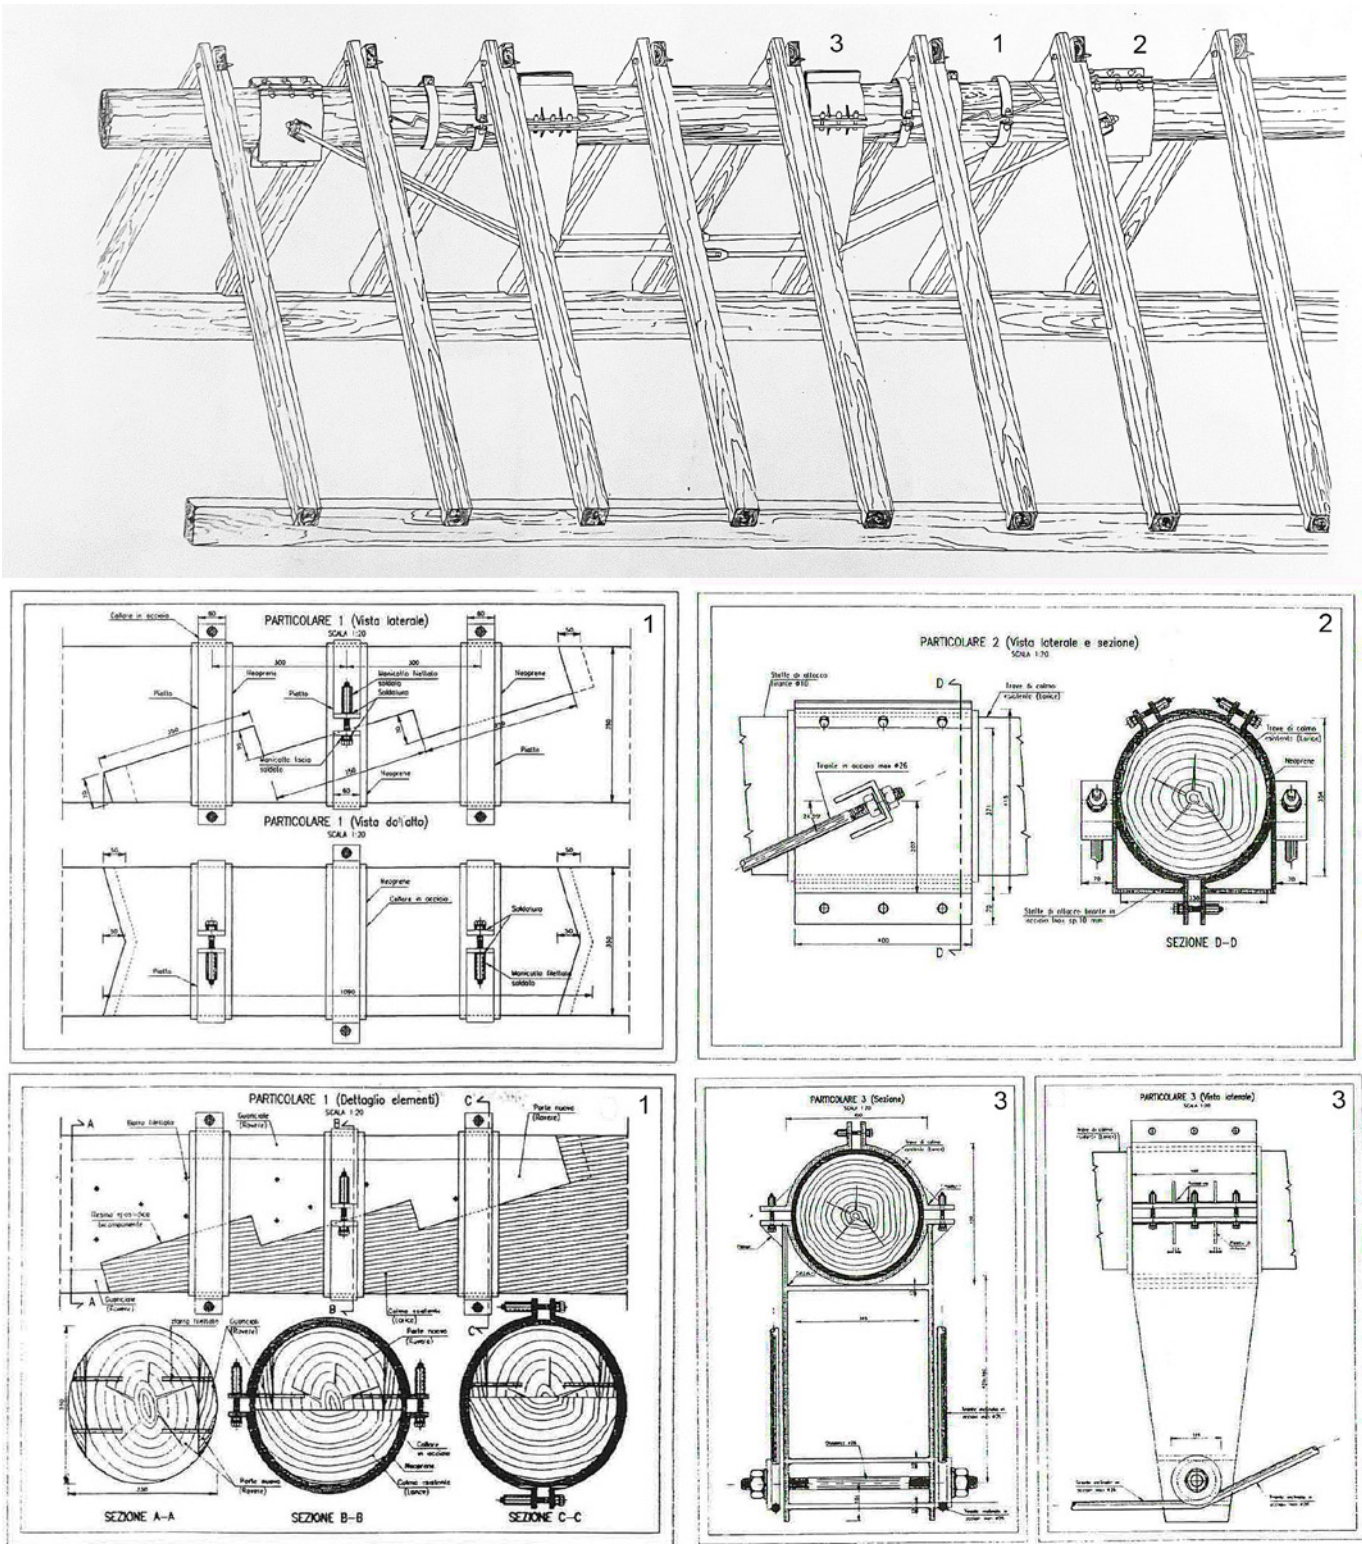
Church of Salbertrand. Reinforcement interventions on the ridge beam. General scheme of the interventions (on top); detail of the double “dart of Jupiter” joint, tightened by 3 bolted stainless-steel collars (1, on the right); and details of the stainless-steel tie rods and struts of the reinforced beam (2 and 3, on the left) system. (Image source: drawings courtesy of C. Bertolini-Cestari).
